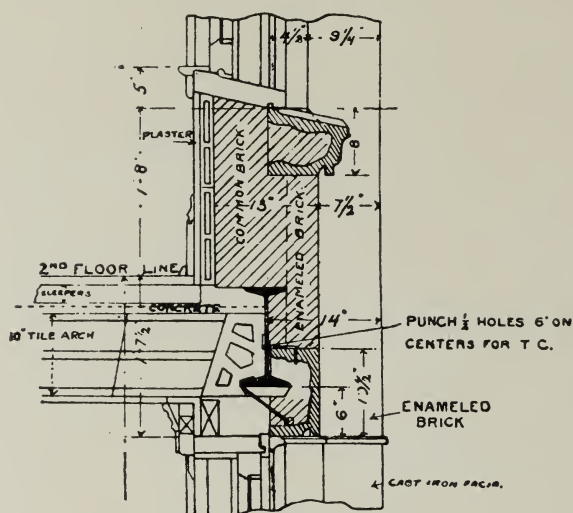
Spandrel Wall Supports. New York Life Building, Chicago.
